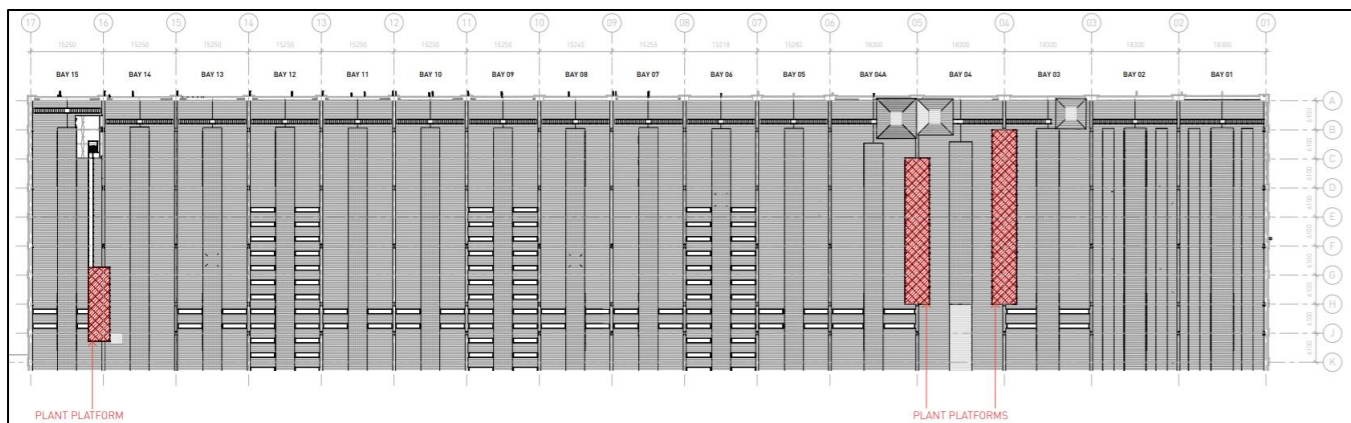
LOCATION OF PROPOSED PLANT PLATFORMS (SOURCE: SISSONS 2018)
